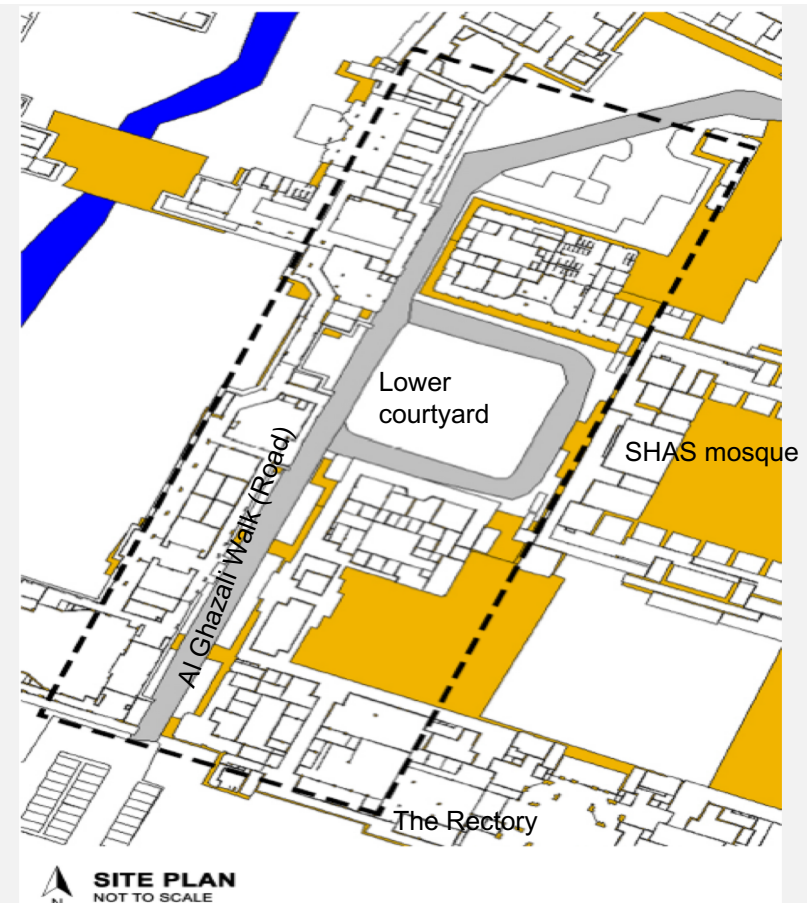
Site Plan of the Ghazali Walk in IIUM Campus
